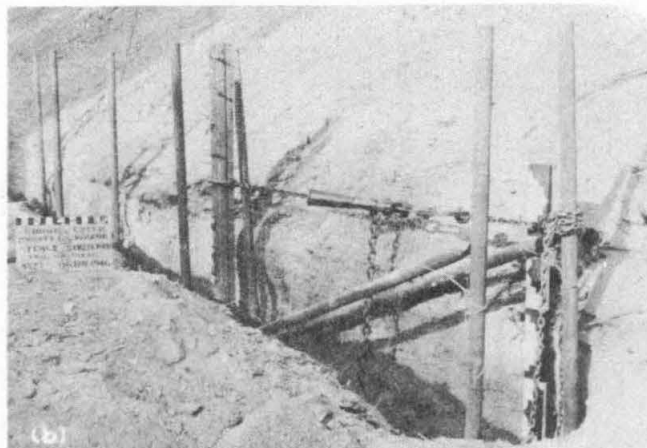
PIPE AND WIRE REVETMENT UNDER CONSTRUCTION
